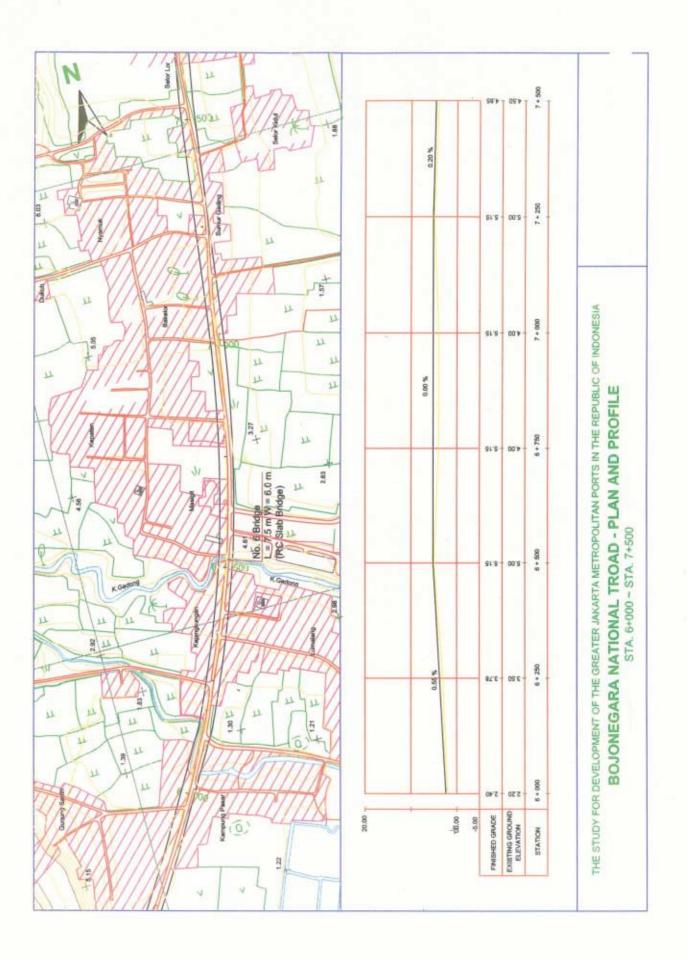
C-15 Bojonegara National Road Plan and Profile (10)
